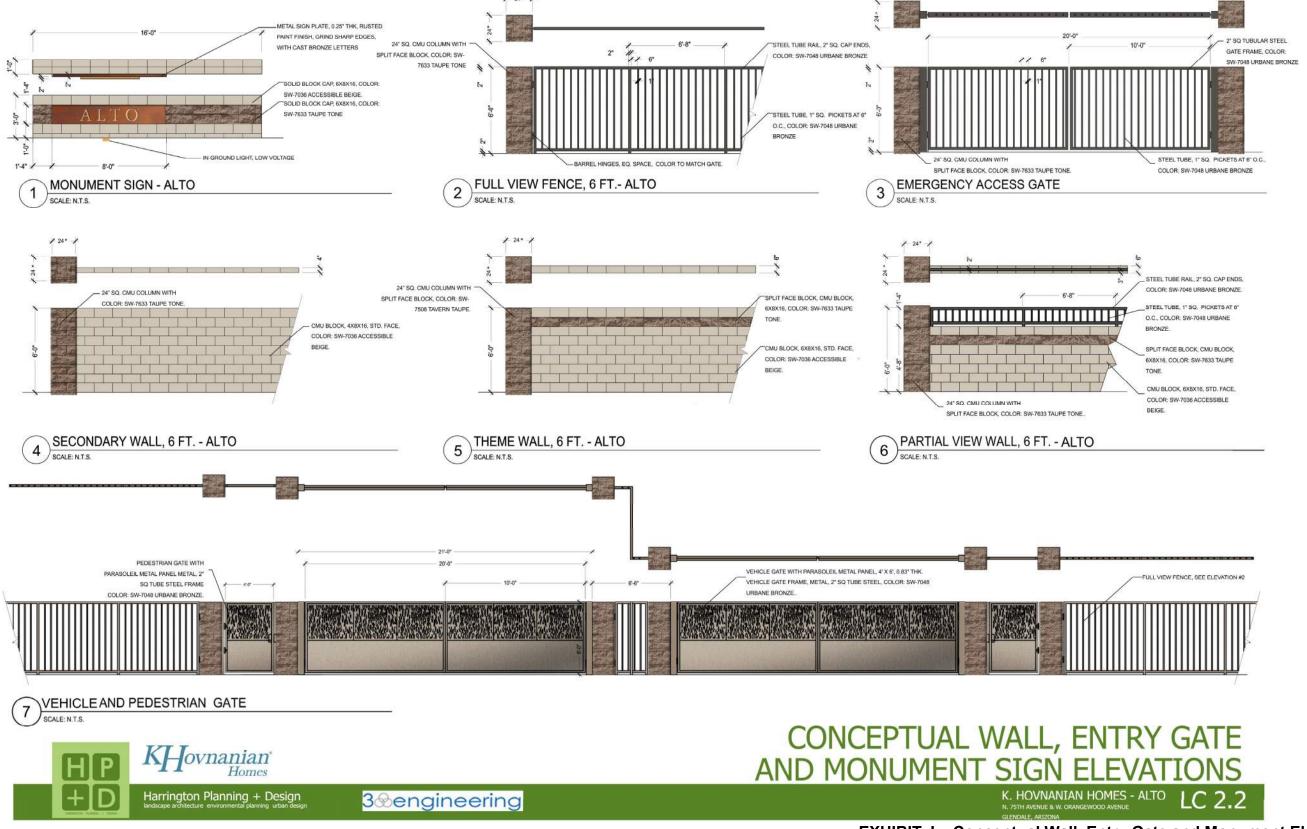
EXHIBIT J – Conceptual Wall, Entry Gate and Monument Elevation
